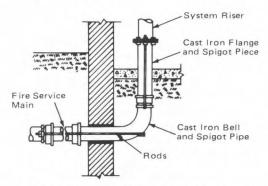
(c) Typical connection to a fire protection system riser.
